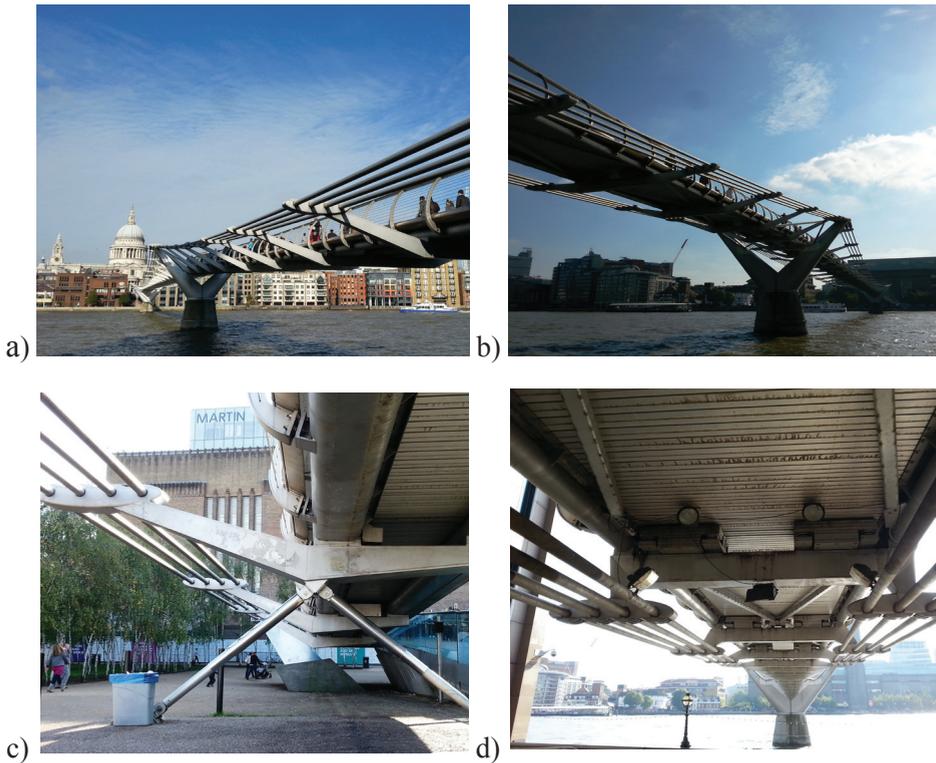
Millennium Bridge a) Suspension cables b) Deck slings to the carrying cables c) Abutment d) Mass dampers
